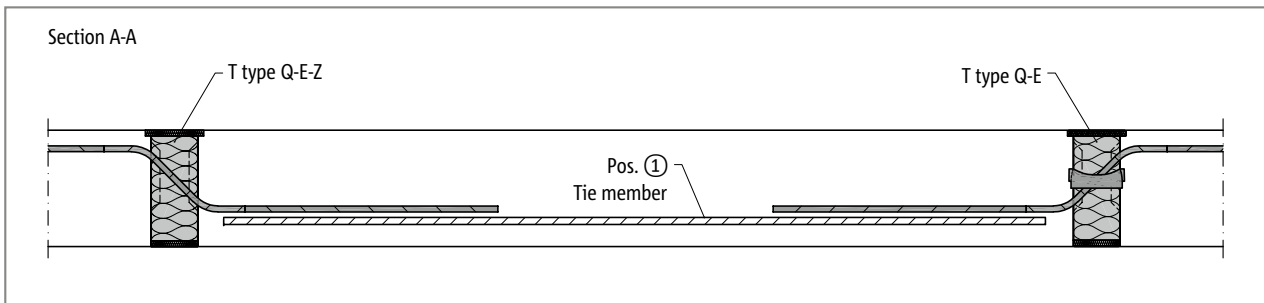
Schöck Isokorb® T type Q-E, Q-E-Z: Section A-A; one-way reinforced concrete slab
